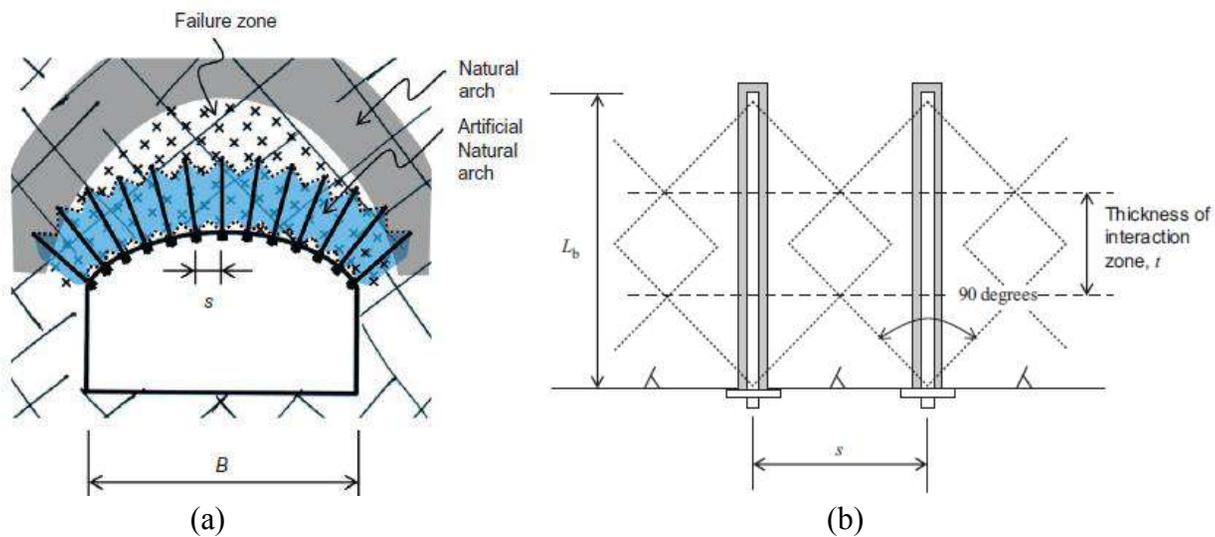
(a) Stabliishing of artificial arch above the tunnel with rock reinforcement and (b) Reinforcement mechanism of rock mass (Li, 2017)
